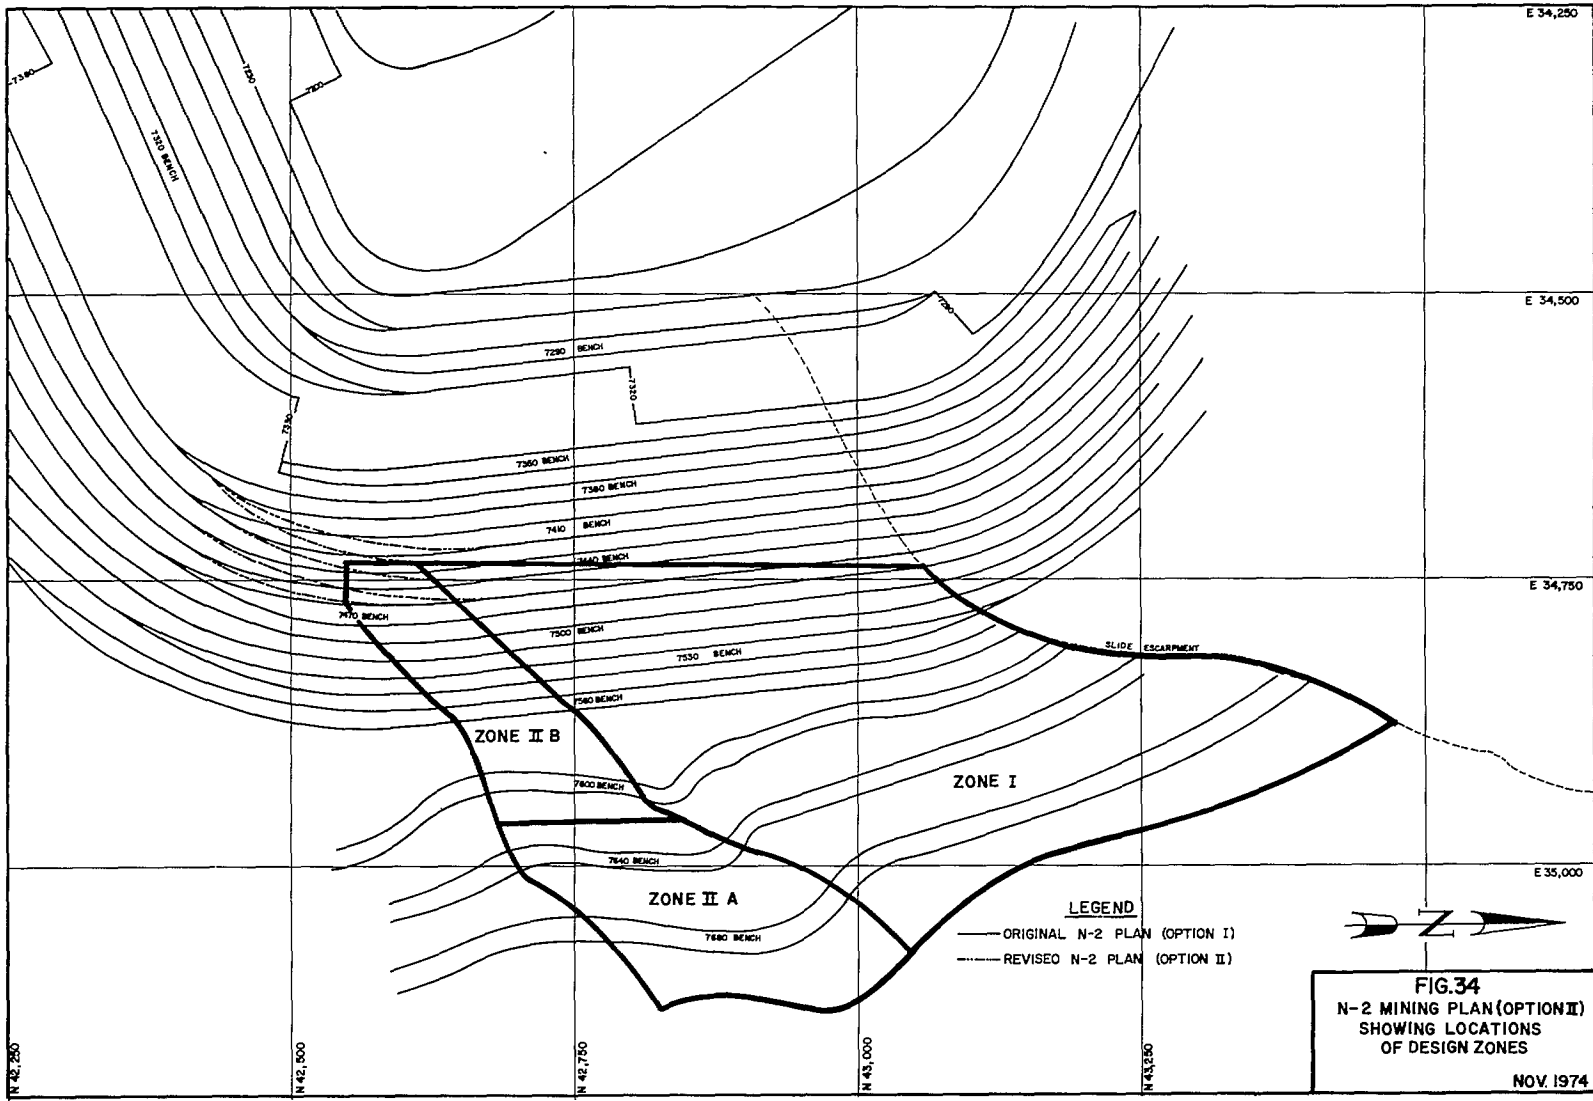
N-2 mining plan (option II) showing locations of design Zones
